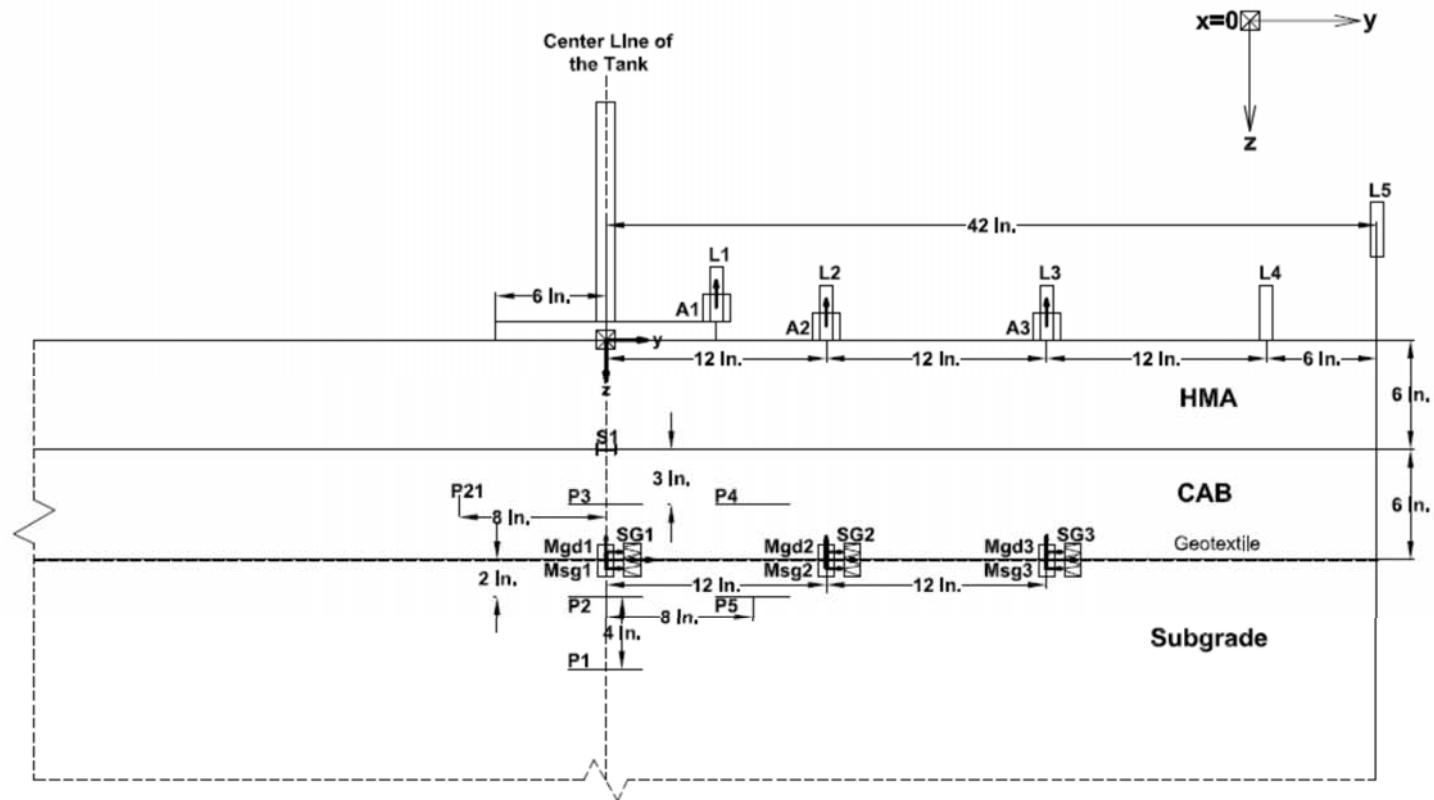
Instrumentation plan for experiment No. 5—Profile view, X = 0 inch
